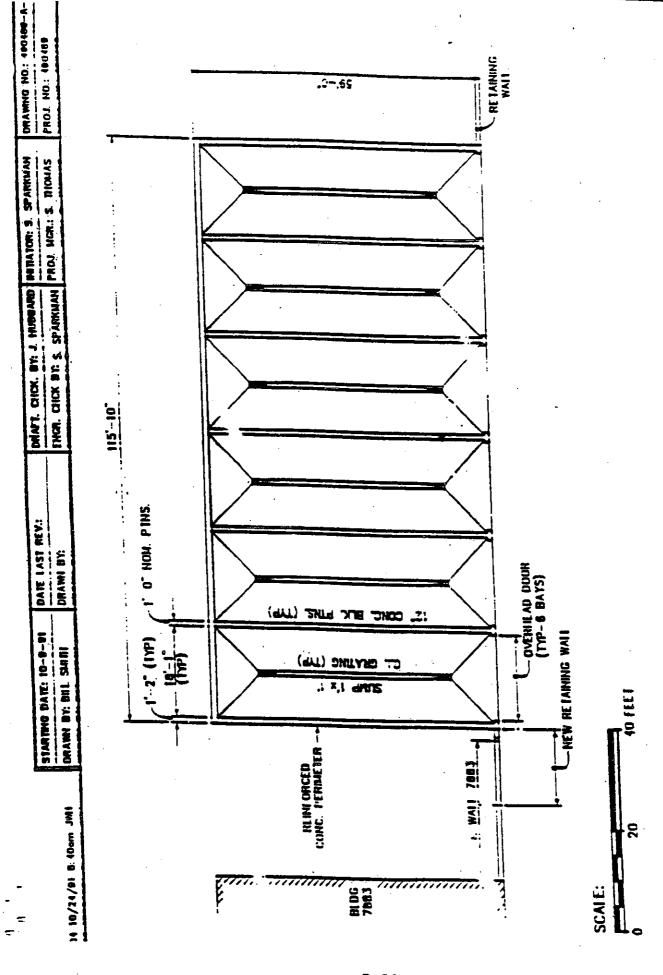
RH-TRU WASTE STORAGE FACILITY II - BUILDING 7884
